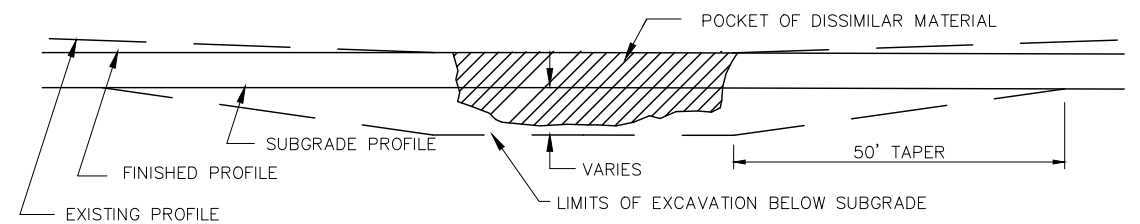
DETAIL FOR EXCAVATION BELOW SUBGRADE AT CUTS
